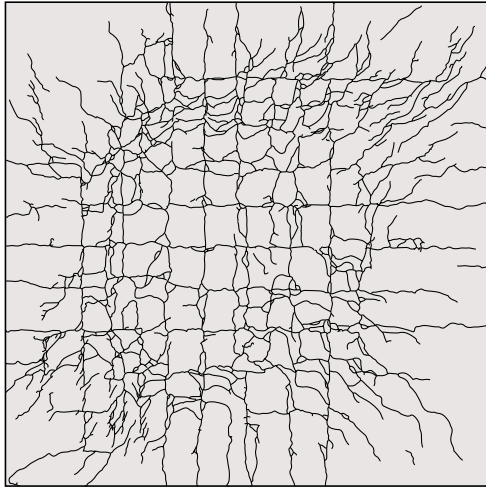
Schematic representation of cracking pattern on bottom surface of specimen PS14 after testing
